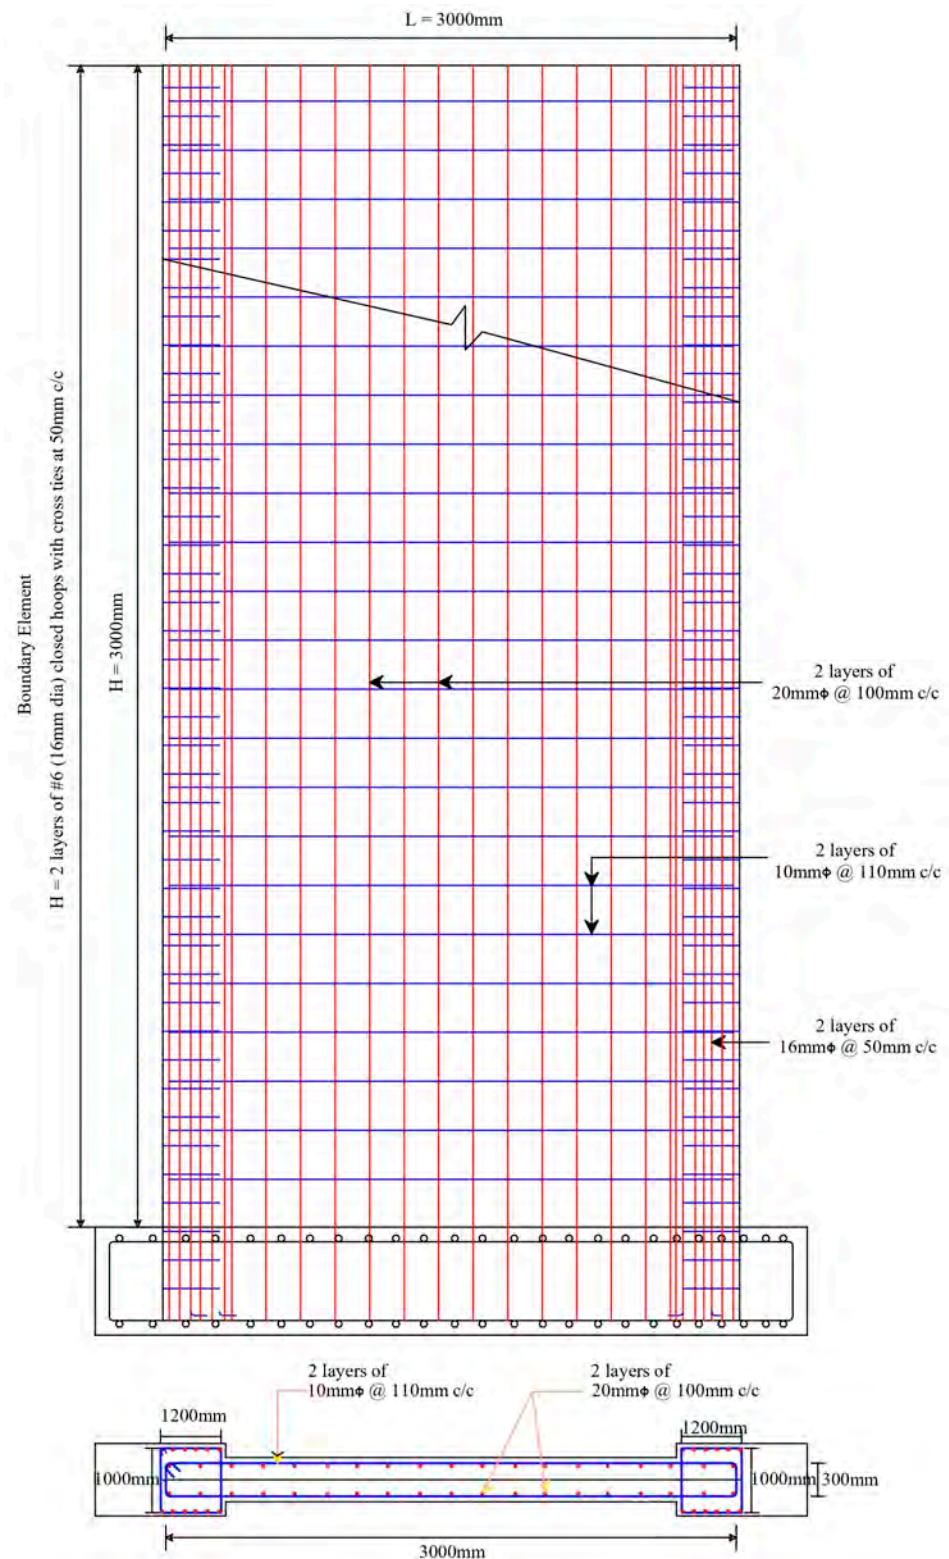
Reinforcement detailing of the 300 mm thick shear wall subjected to R3 blast cases (rectangular-shaped building).
